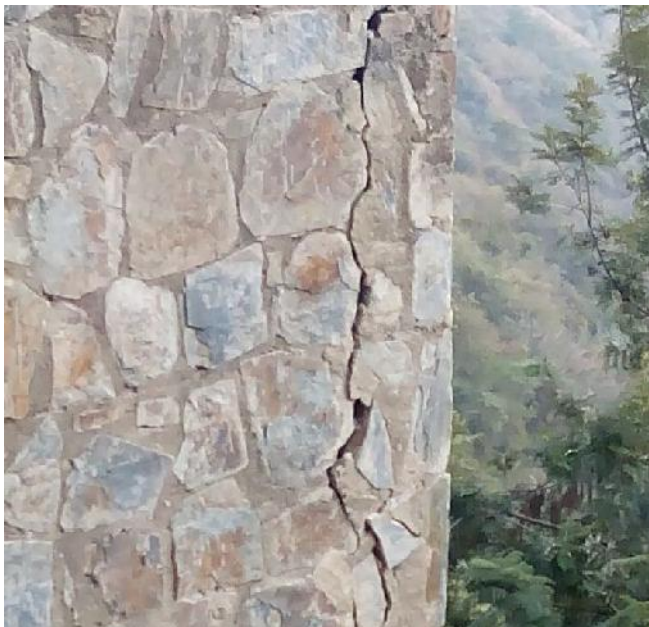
and 2.2 Top view of the cracks in shear wall
